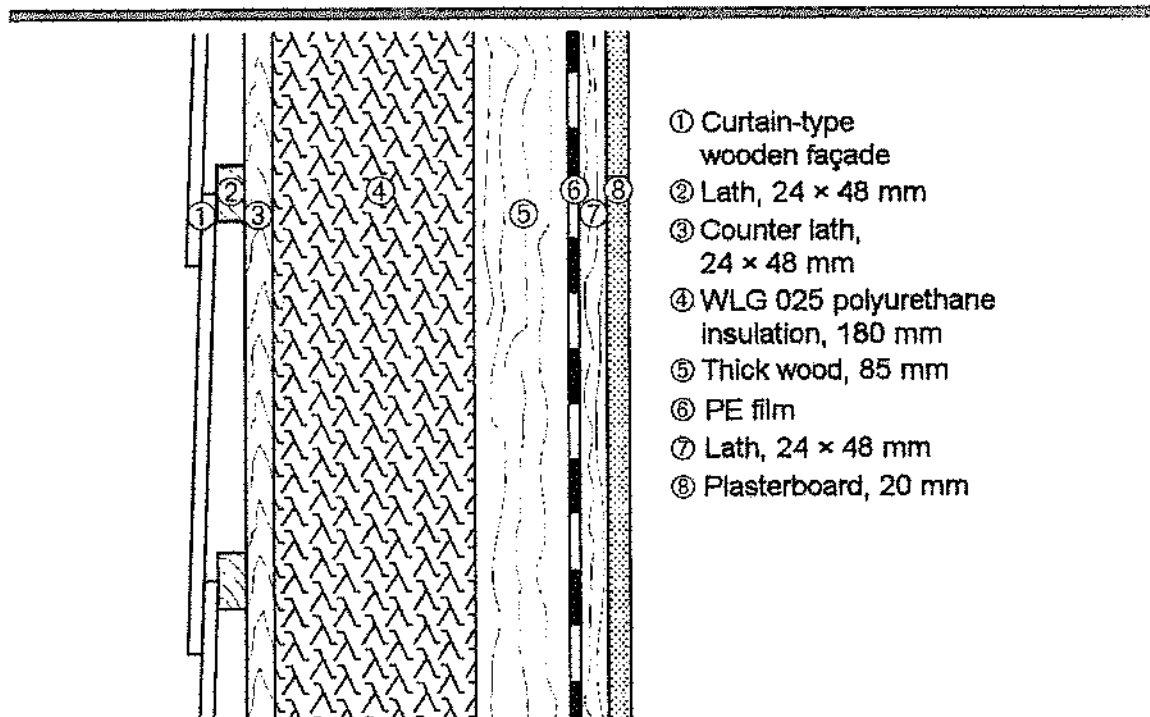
Polyurethane passive house with a rear-ventilated façade
